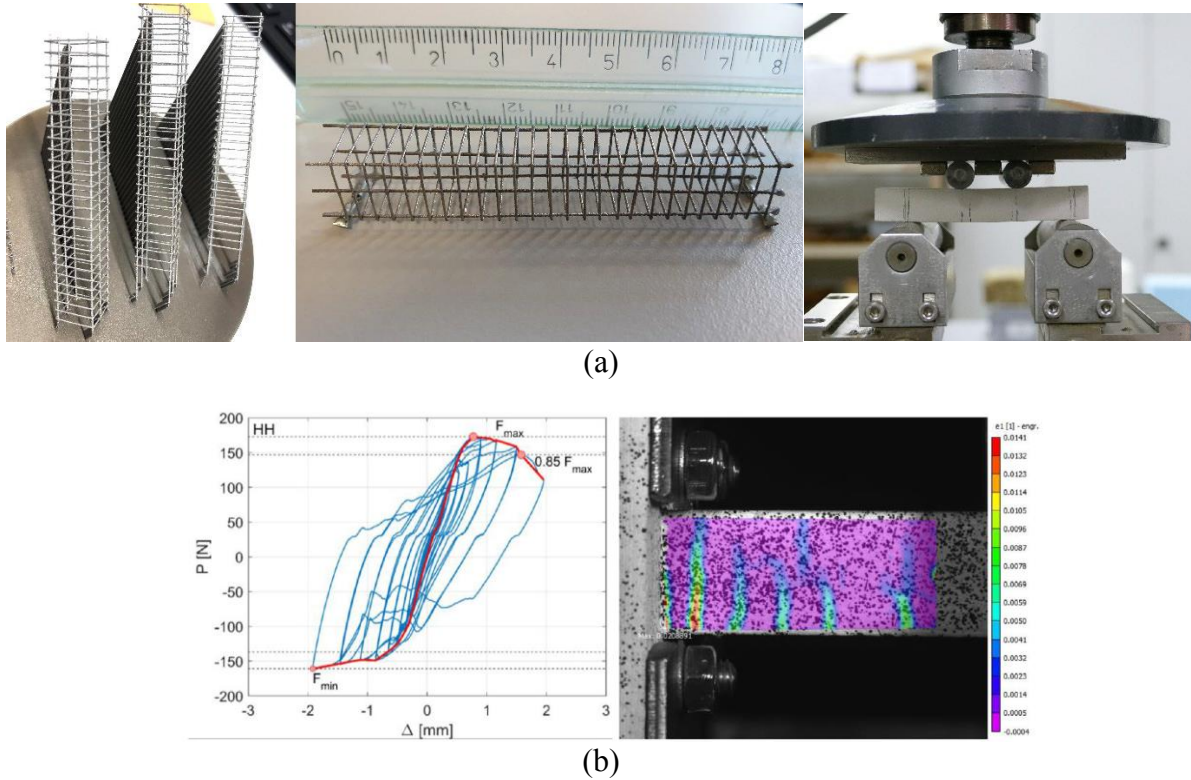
(a) Four-point bending tests on 3D printed steel reinforced micro-concrete beams [17] (b) Lateral cyclic loading tests on 3D printed steel reinforced micro-concrete columns [19].
